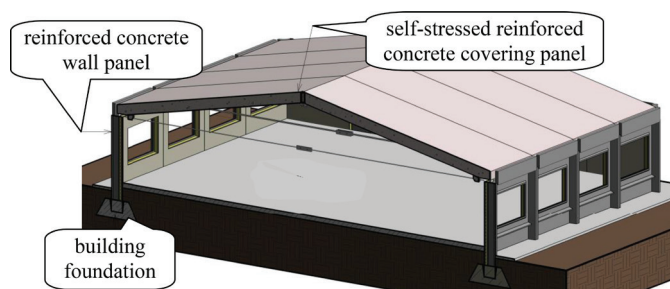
Structural scheme of walls of quickly assembled buildings using prefabricated reinforced concrete panels
